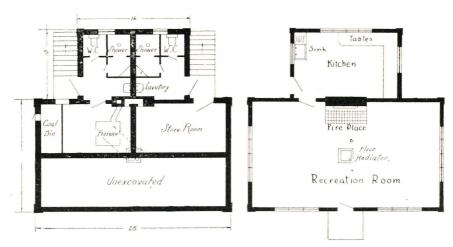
Basement and floor plan of shelter house shown in Fig. 10.
